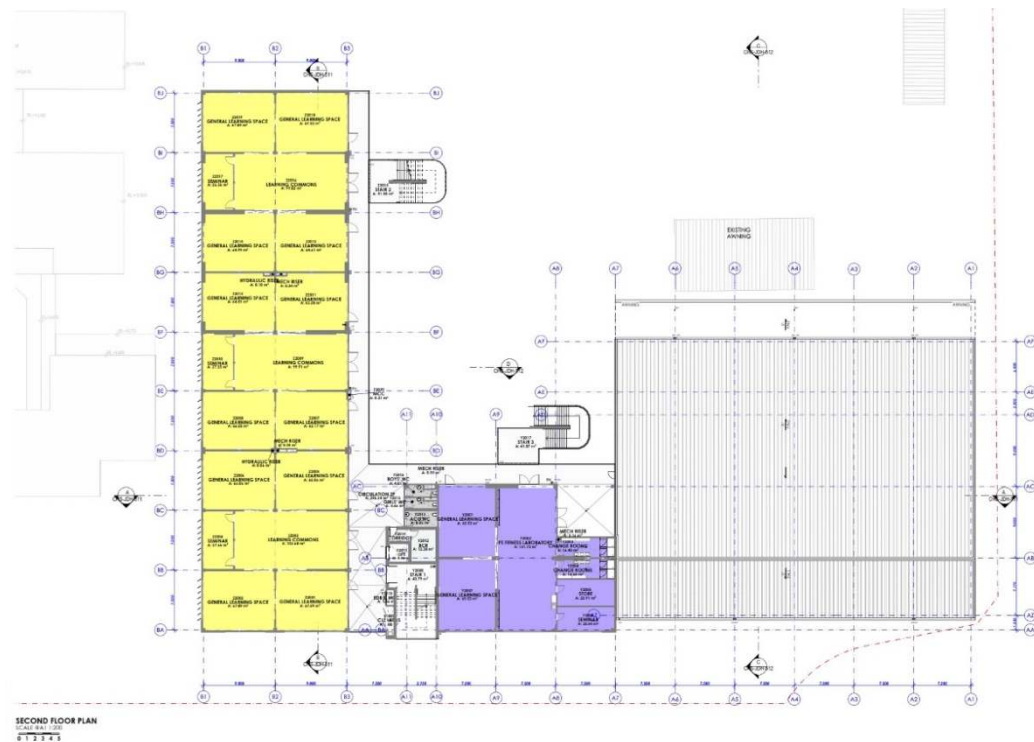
Second floor plan. *Source:* JDC Architects 2023.
